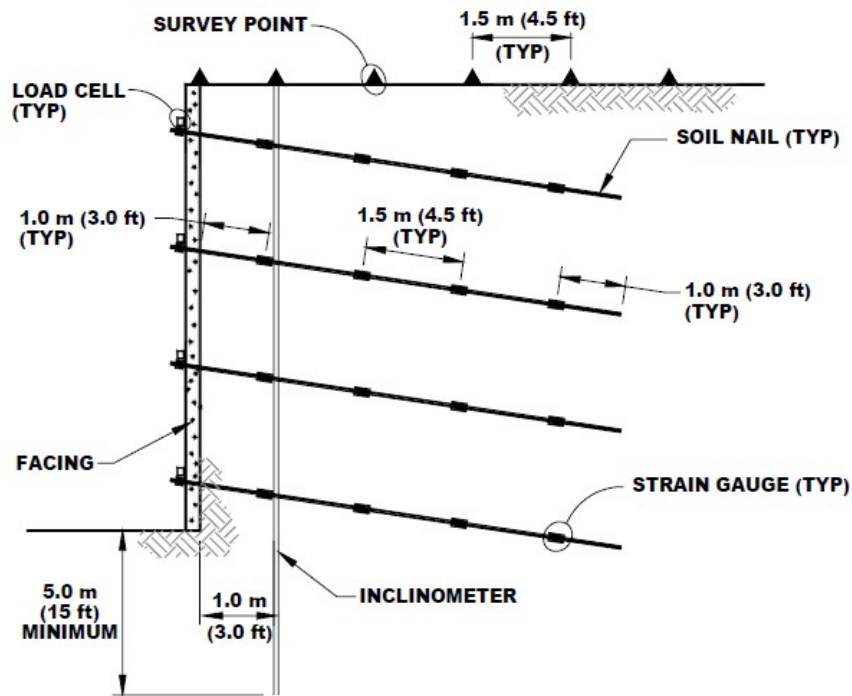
Soil Nail Load Testing Setup (after GEC#7, 2003)
